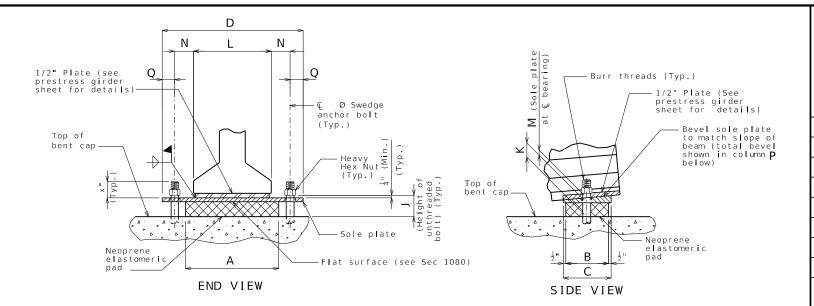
/4"Ø THRU 2 1/2"Ø ANCHOR BOLTS
